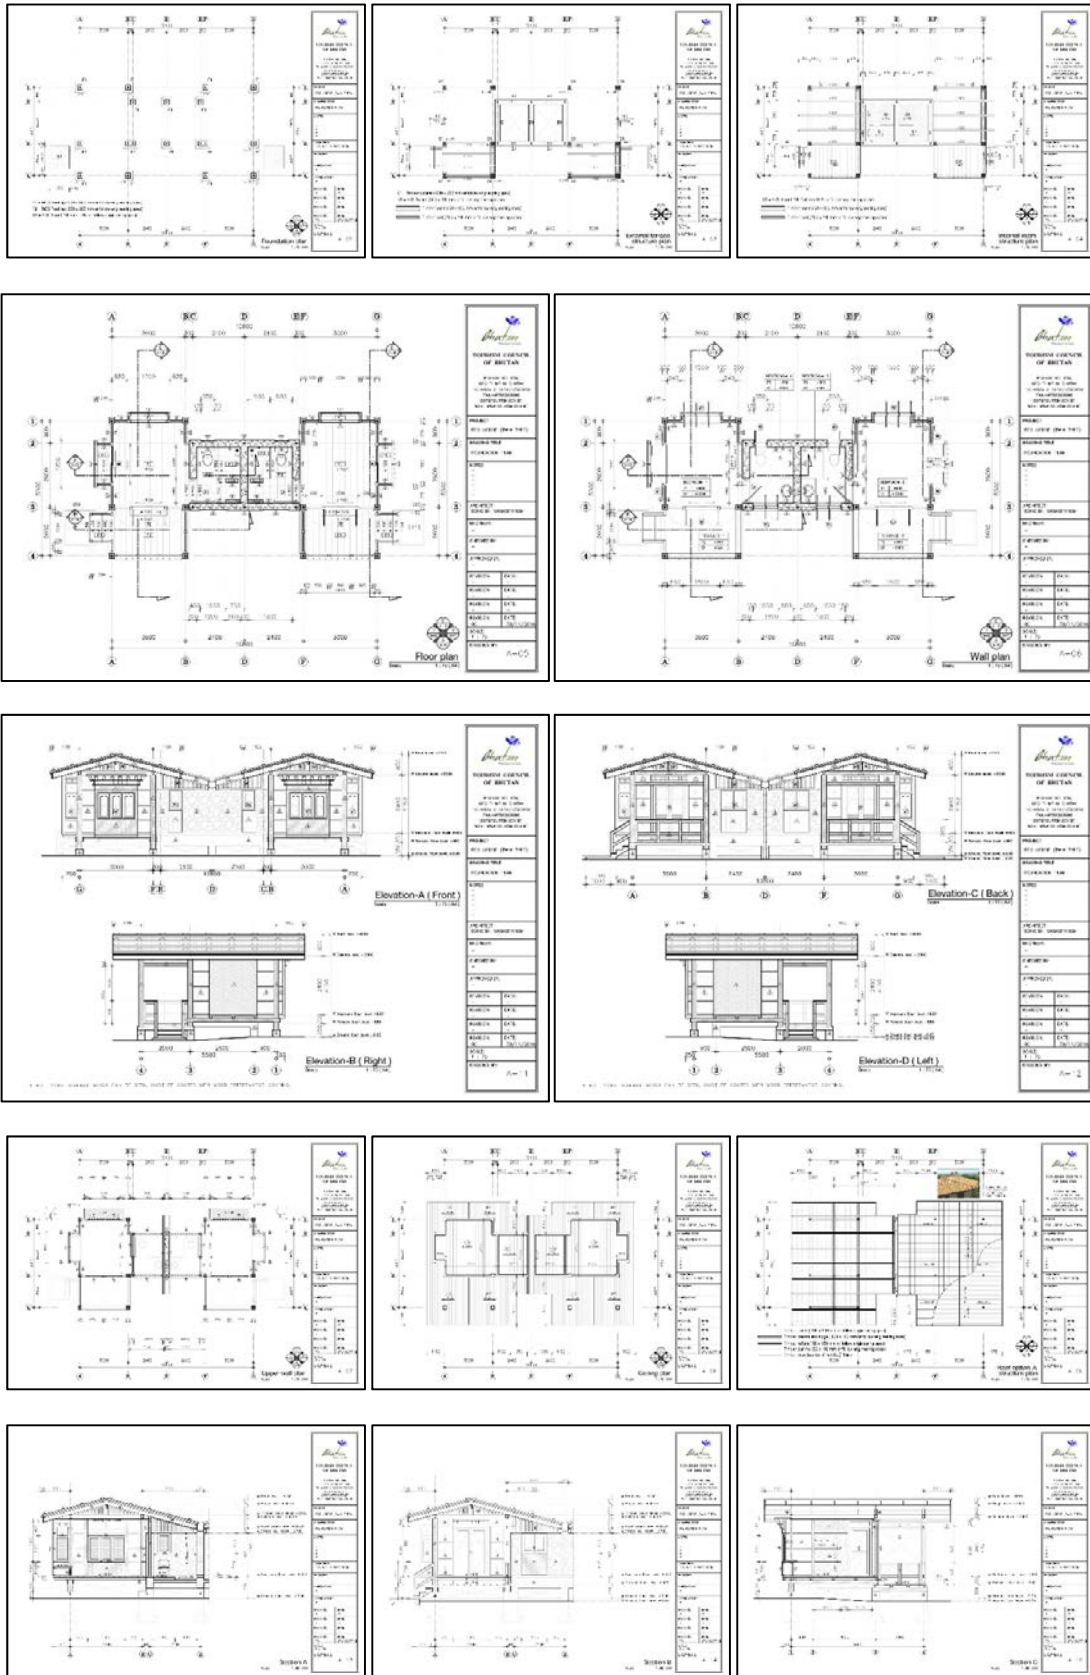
Construction drawings of twin type villa at Manas eco lodge.
